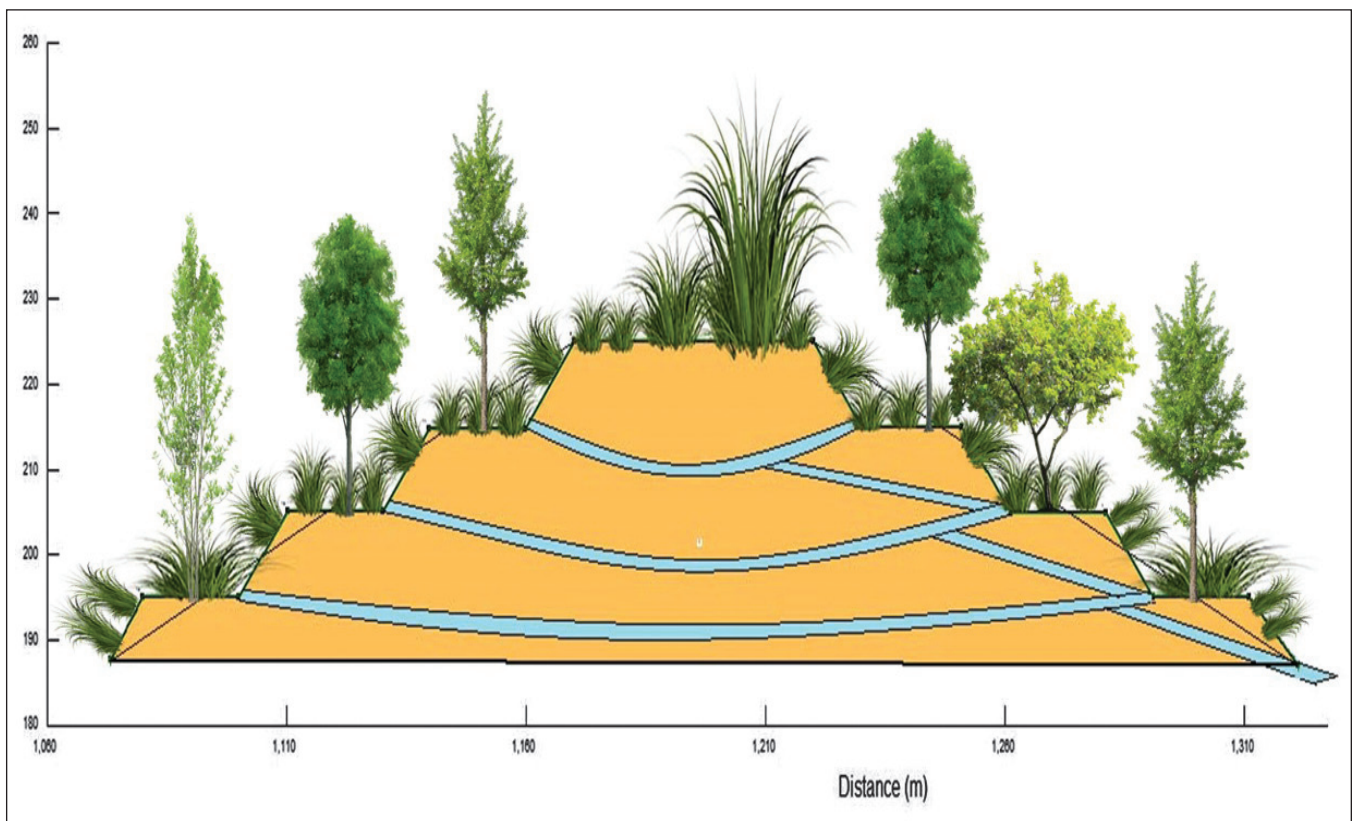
Drainage and plantation in the OB and BC soil dump. All the diversion ditches in the terraces have to be connected in a manner so that the water collected in the ditches, via drains now looking like a garland, finally go to the sediment pond outside the dump area.
